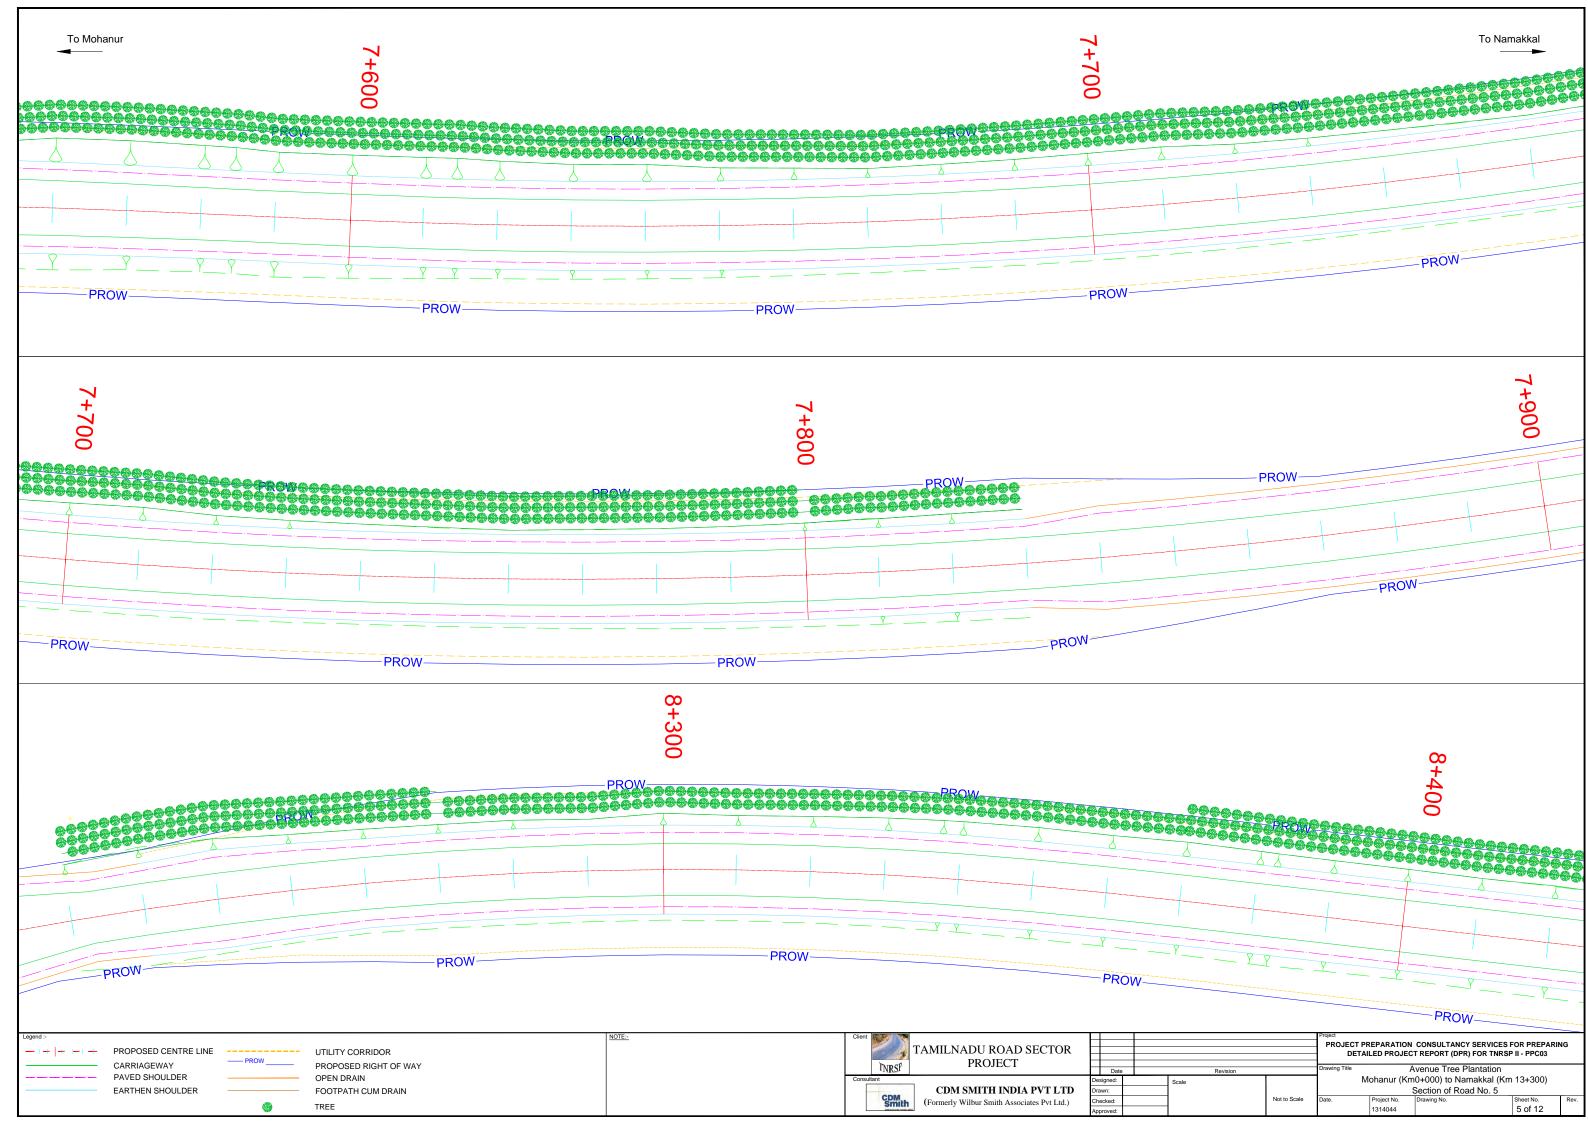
ALIGNMENT PLAN SHOWING AVENUE TREE PLANTATION
